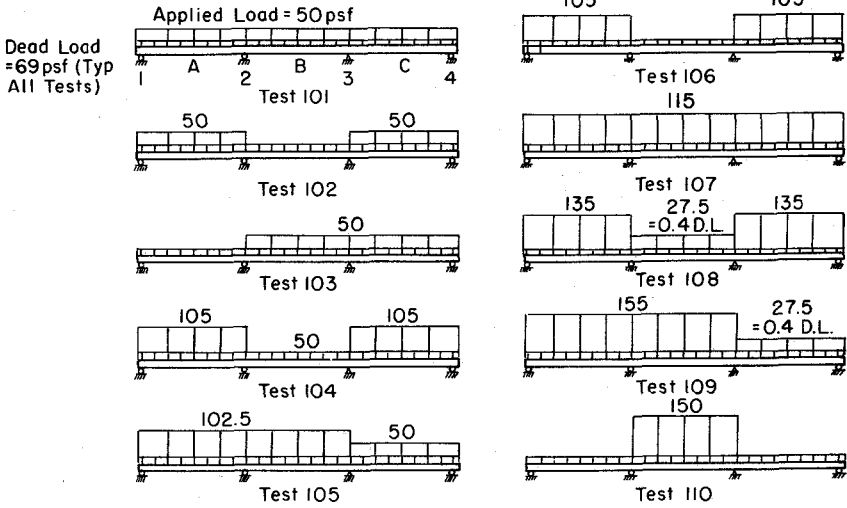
Load patterns for Slab A. Note: 1 psf = 47.9 Pa.
